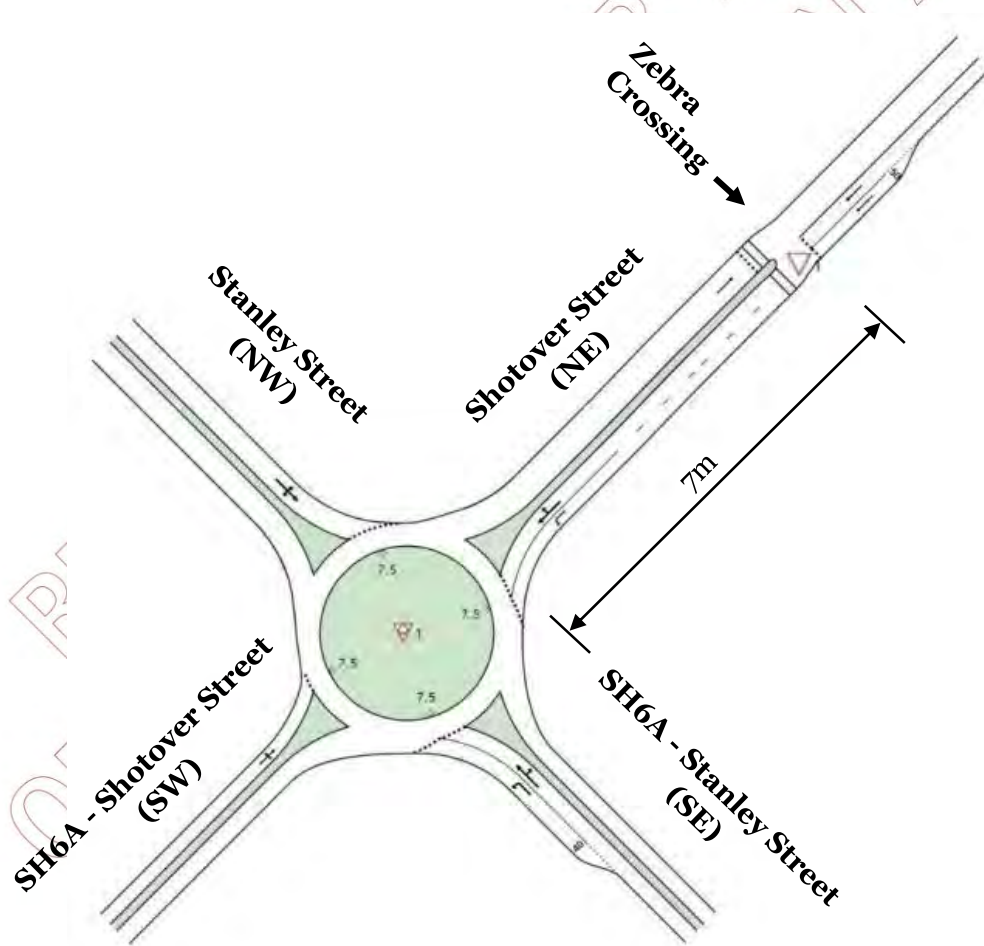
Layout of existing intersection SIDRA model (not to scale)
